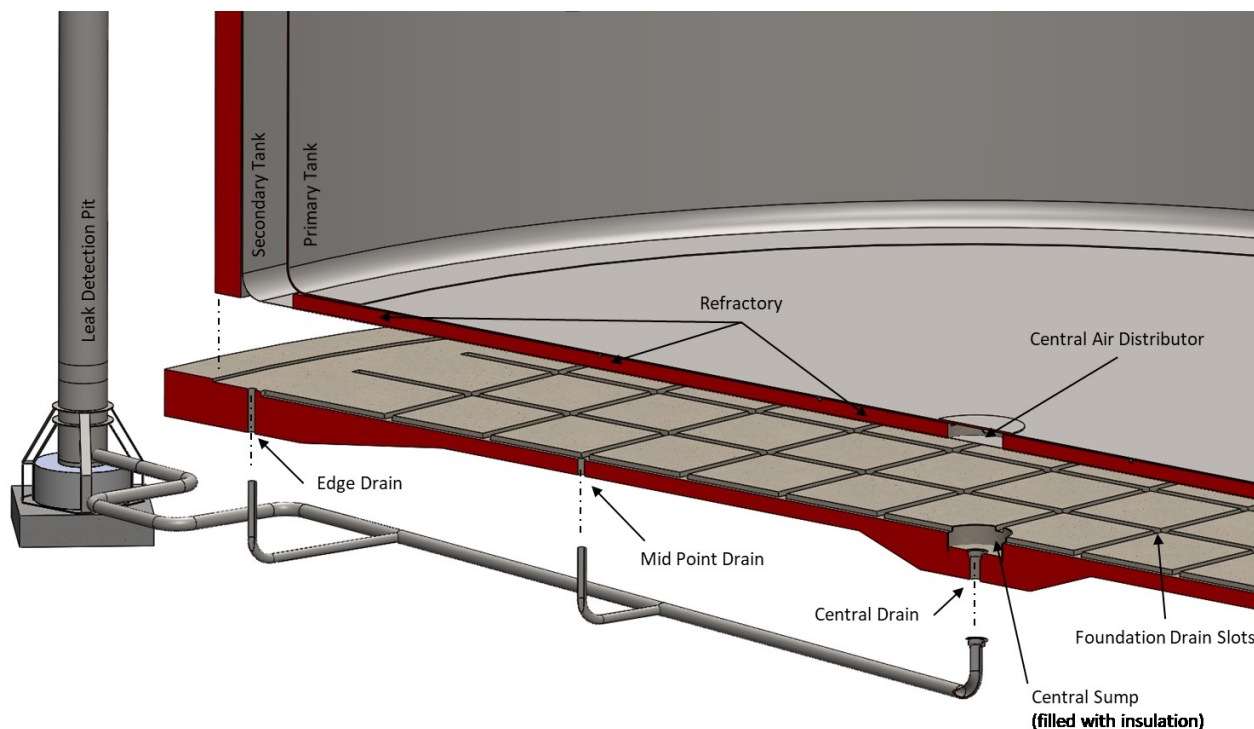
Schematic of a double shell tank depicting primary and secondary tank shells, concrete foundation, and drain slots.
